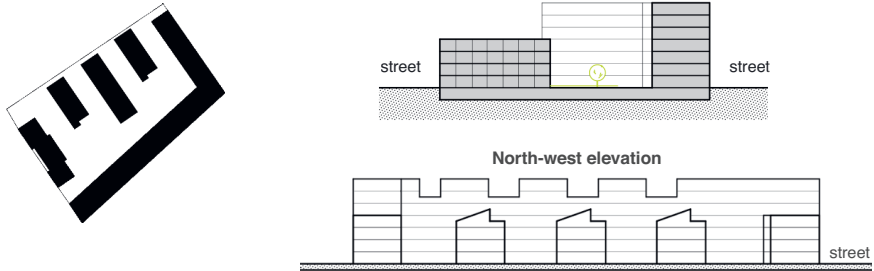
Example of variation of podium type with the lowest storey entirely under the ground – plan drawing (within zoning plan limits), section showing built and outdoor spaces relative to the surrounding streets, and north-west elevation; case located in Sigurd Hoels vei 42–110
